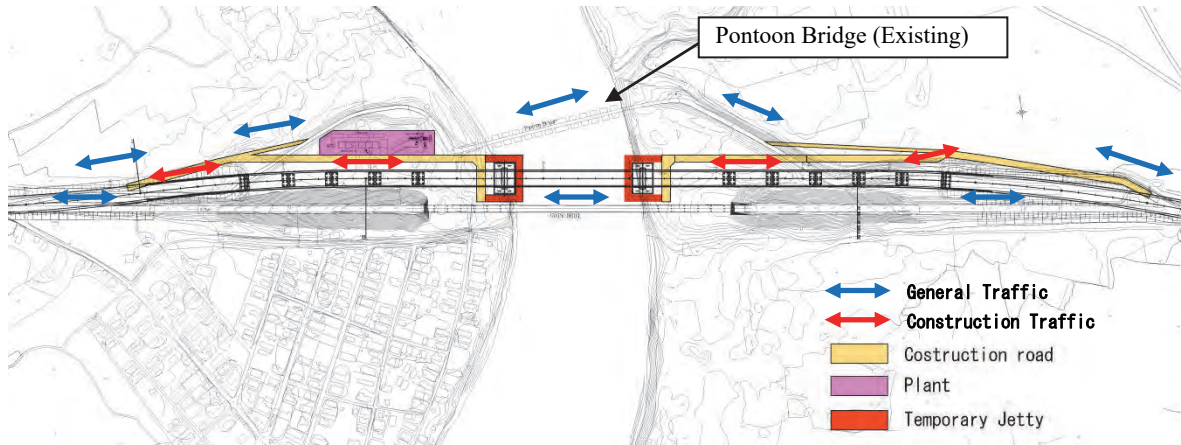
Layout of Temporary Access Road and Construction Yard (Naung Lon Bridge)
